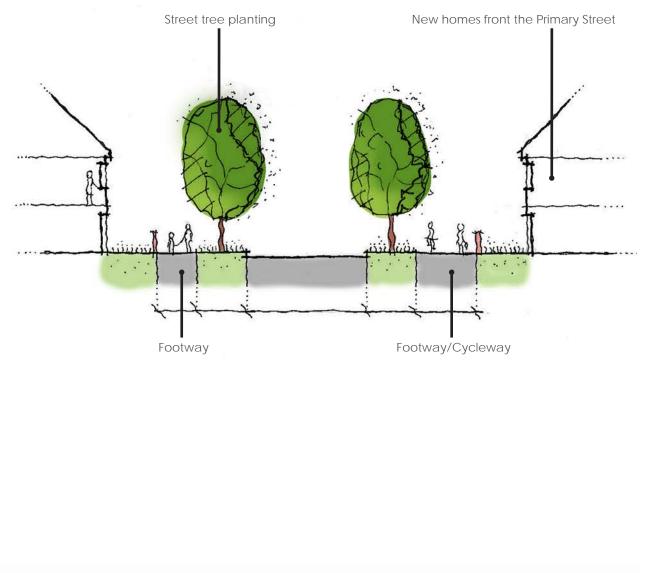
Illustrative cross section of the Primary Street (Not to scale).
